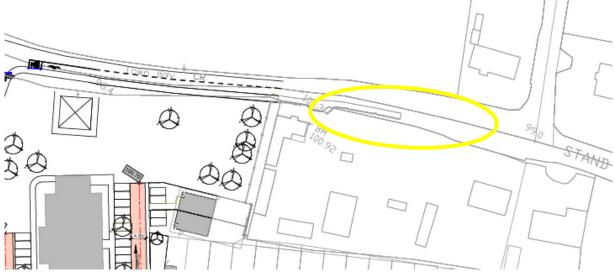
MAL-00-XX-C-005 Rev B, Standhouse Road Footpath.
